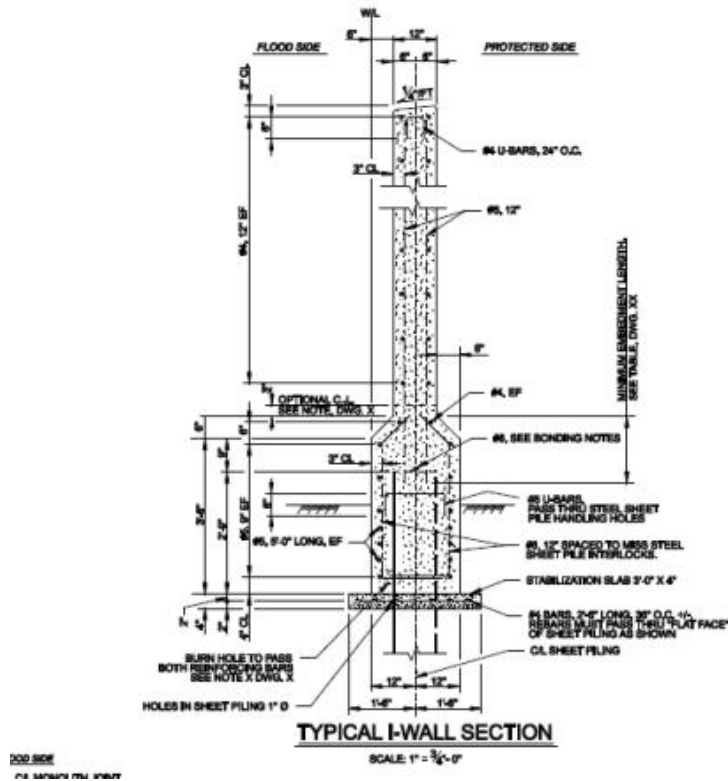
Typical cross section of I-wall (USACE, 2008)
